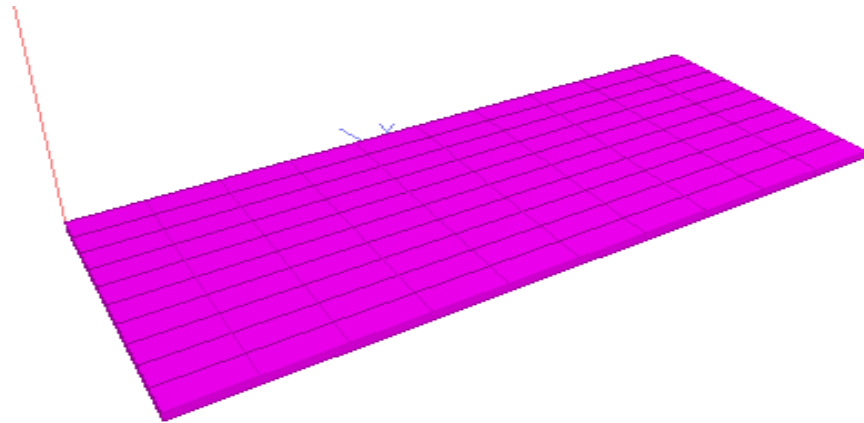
3D view of slab with 17m span length at 15° skew angle
